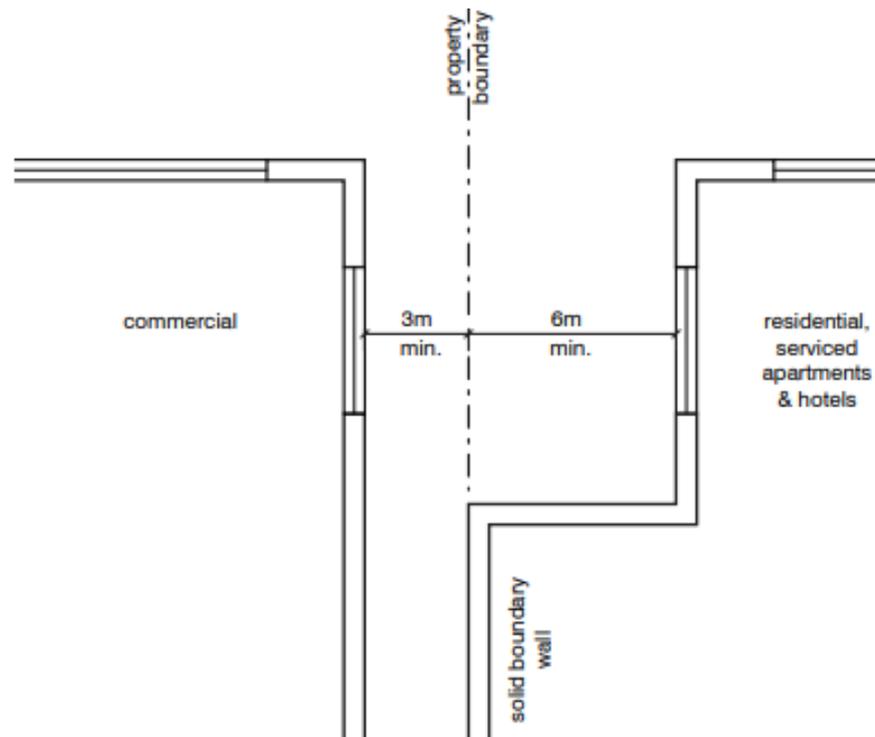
Extract of Figure 5.9 from the Sydney DCP 2012, indicating a nil side boundary setback to a residential building constructed with a solid boundary wall
